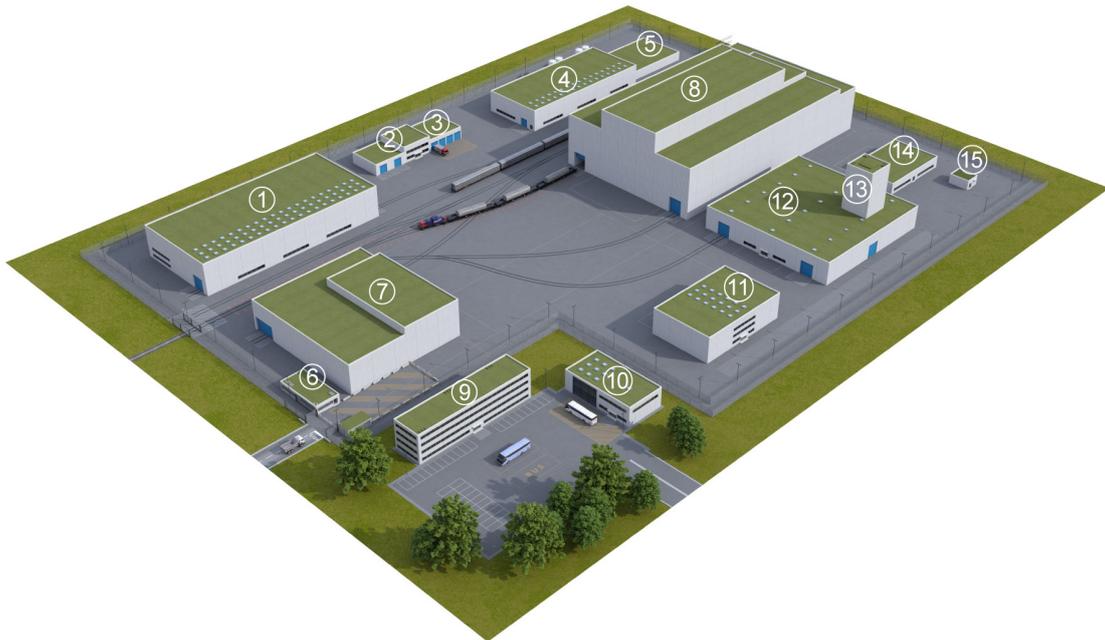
Schematic layout and design of the facility elements and surface facility structures for a combined repository
